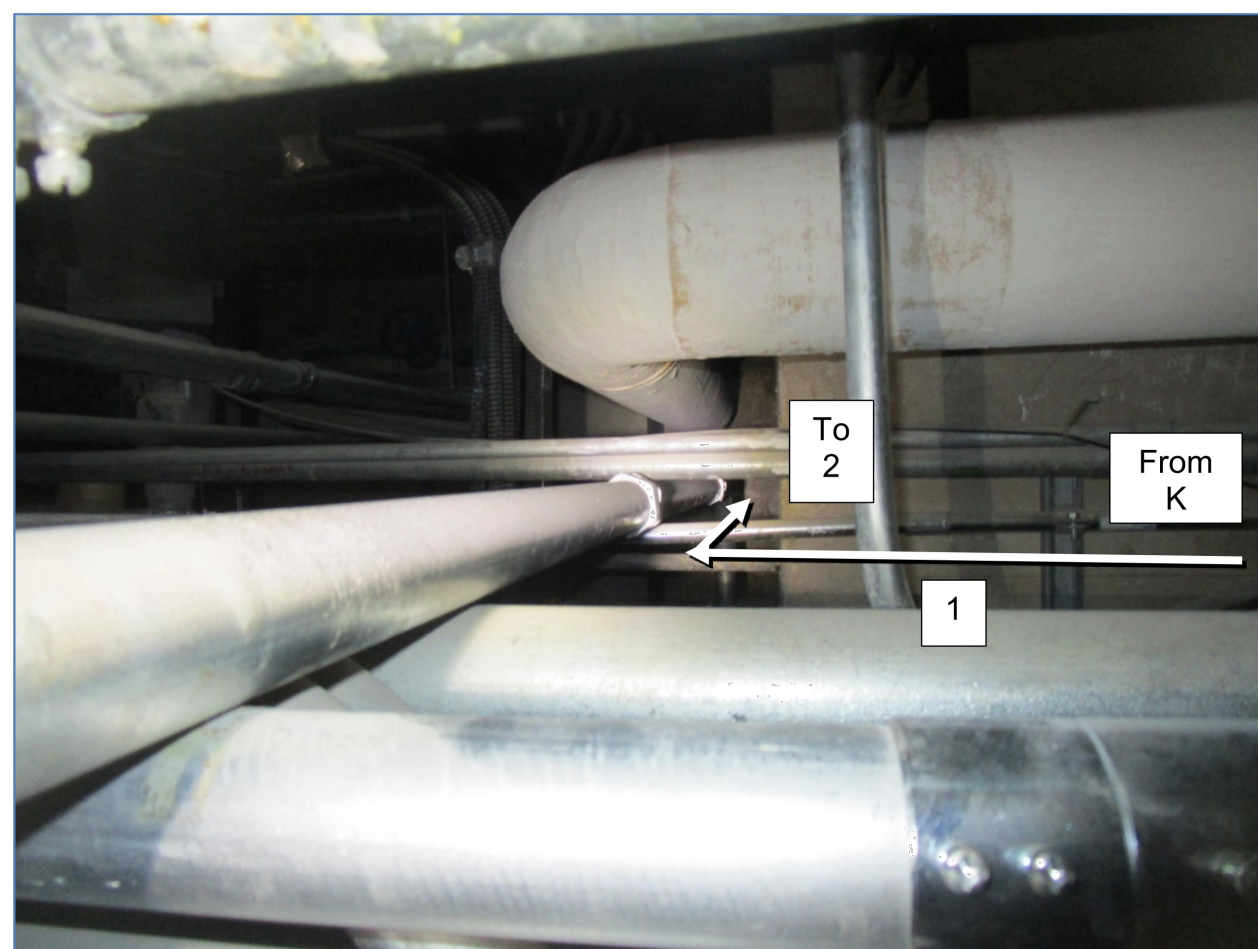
Location L, bend around corner and into tunnel beneath dome (View 2)
